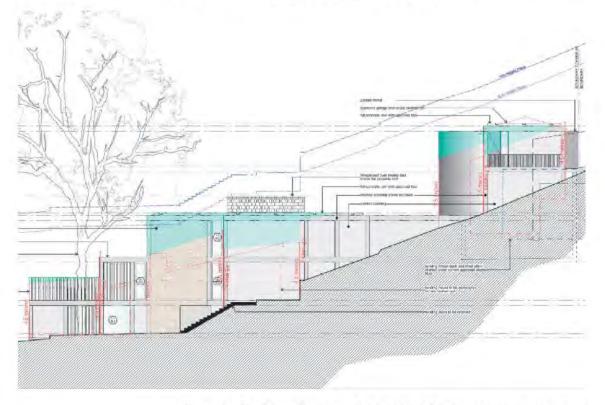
Southern elevation - Extent of building envelope non-compliance
